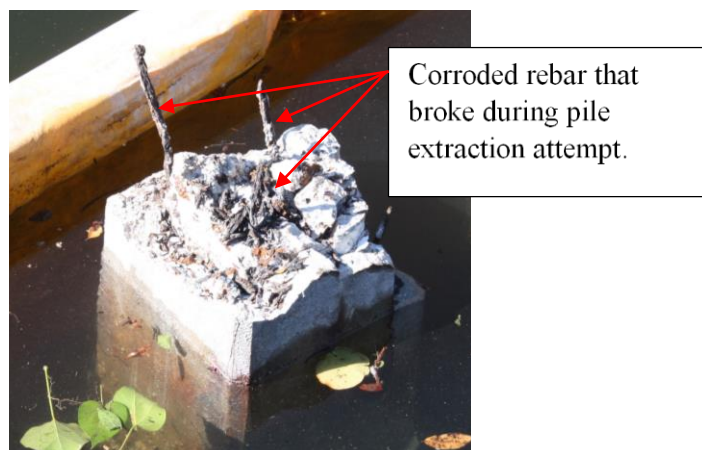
Bottom half of pile left in place. (Bridge C) Note visible rebar corrosion and section loss in splash zone that resulted in pile breakage during extraction attempt.
